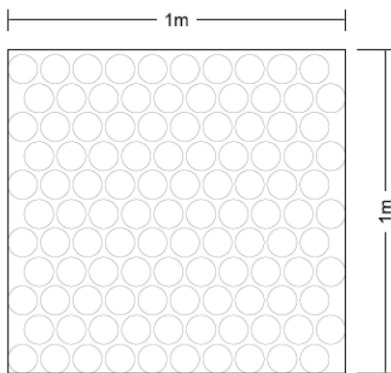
Elevation of the wall portion of 1m x 1m size [Auto---cad drafting]
